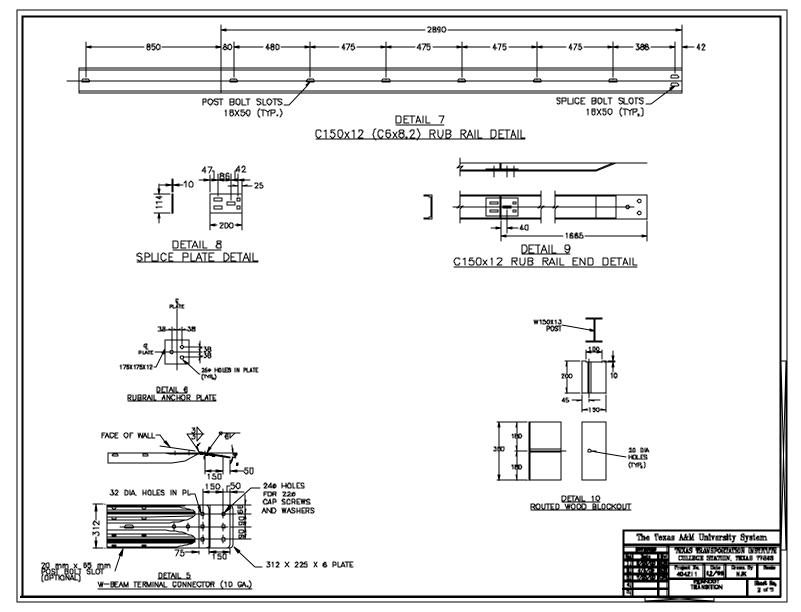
Details of the Pennsylvania transition installation for test 404211-3 (continued).
